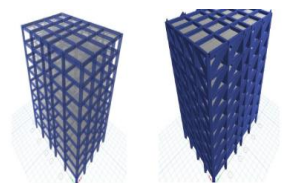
G+8 Building (Bare & Infilled Frame)
